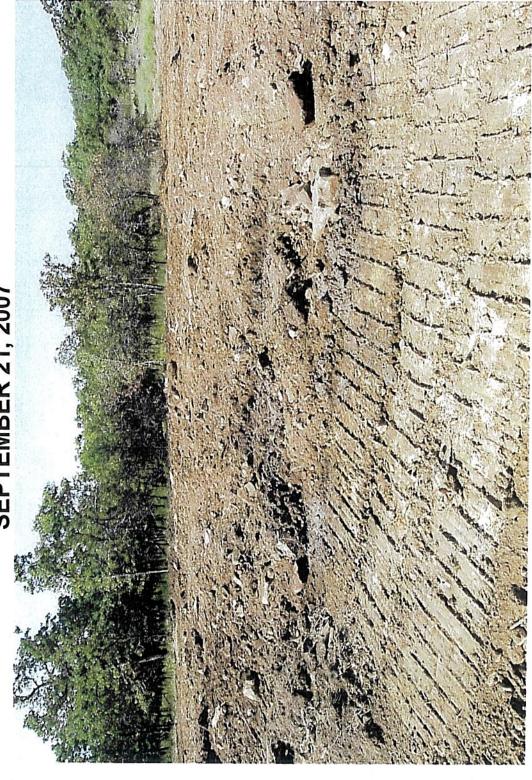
taken west. Close-up of soft and mushy area wet from pit soaked soils.
